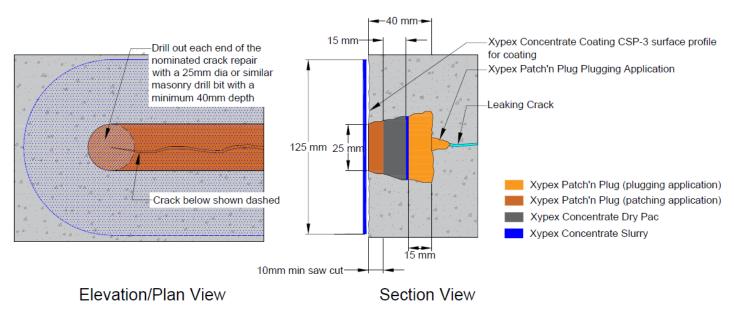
, Details of the leaking crack repair/cold joint (Schematic)
